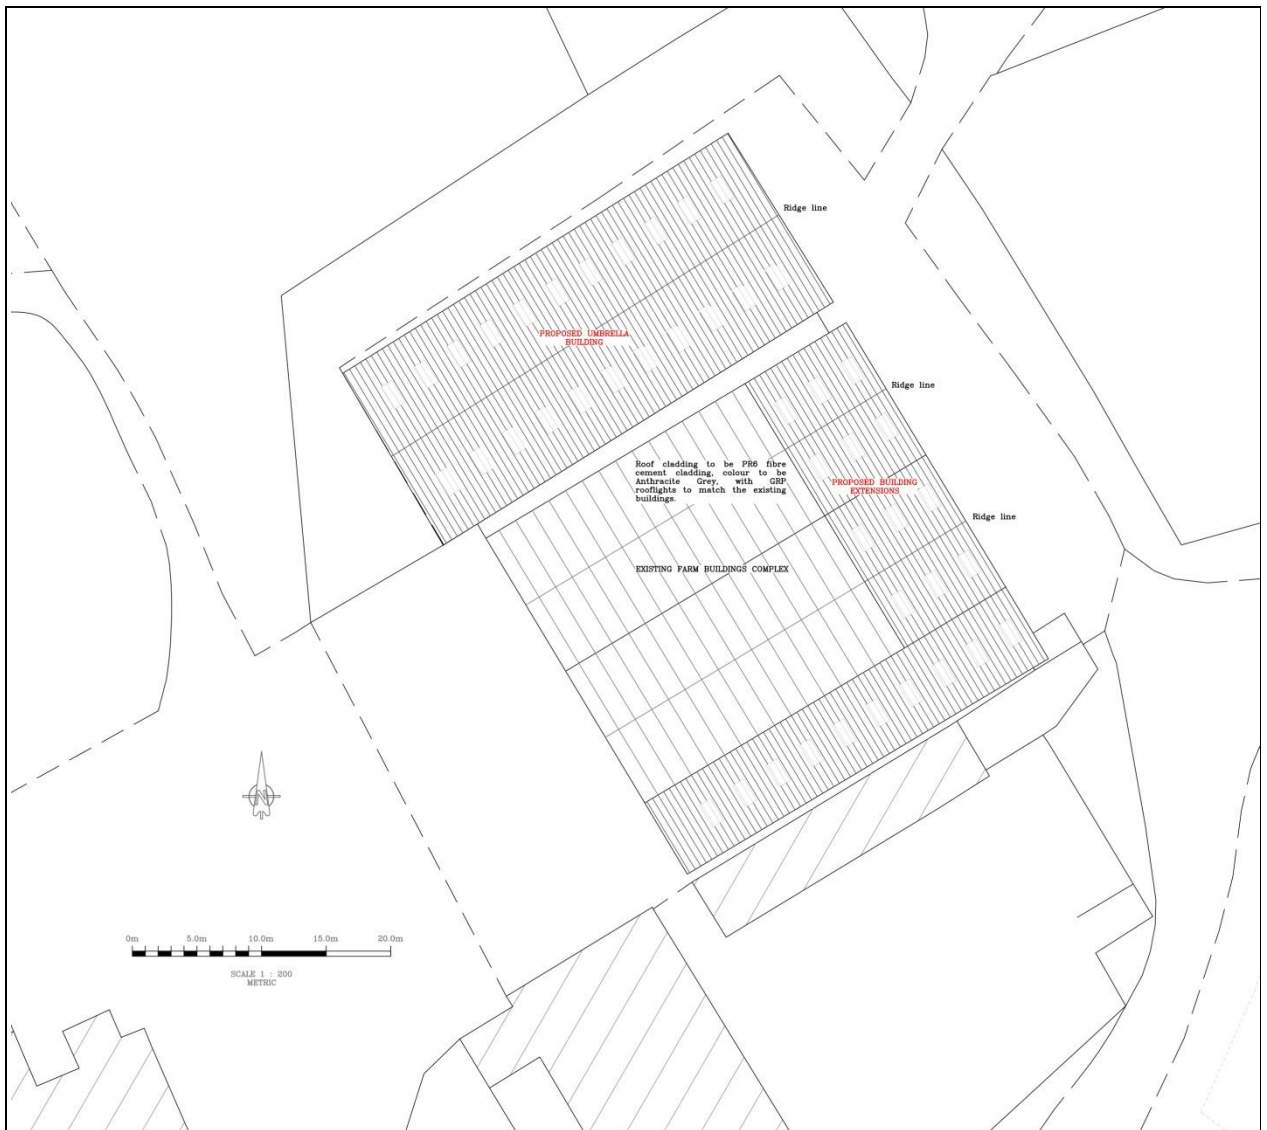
ROOF PLAN OF THE PROPOSED WORKS (IMAGE PROVIDED BY THE AGENT).
